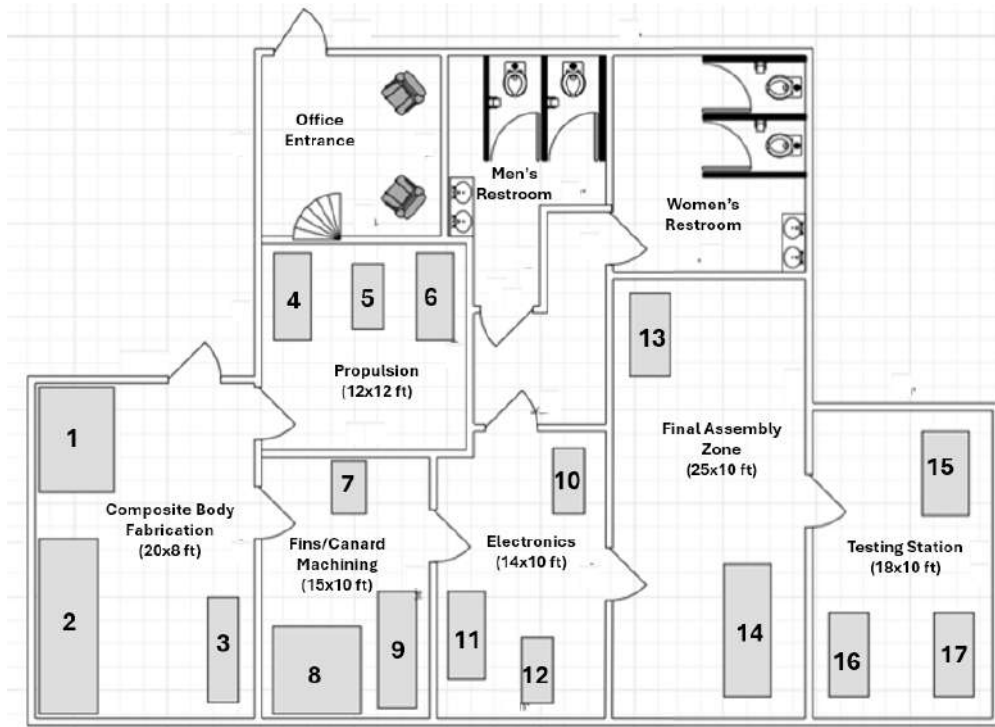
Manufacturing Floor Plan Floor One
